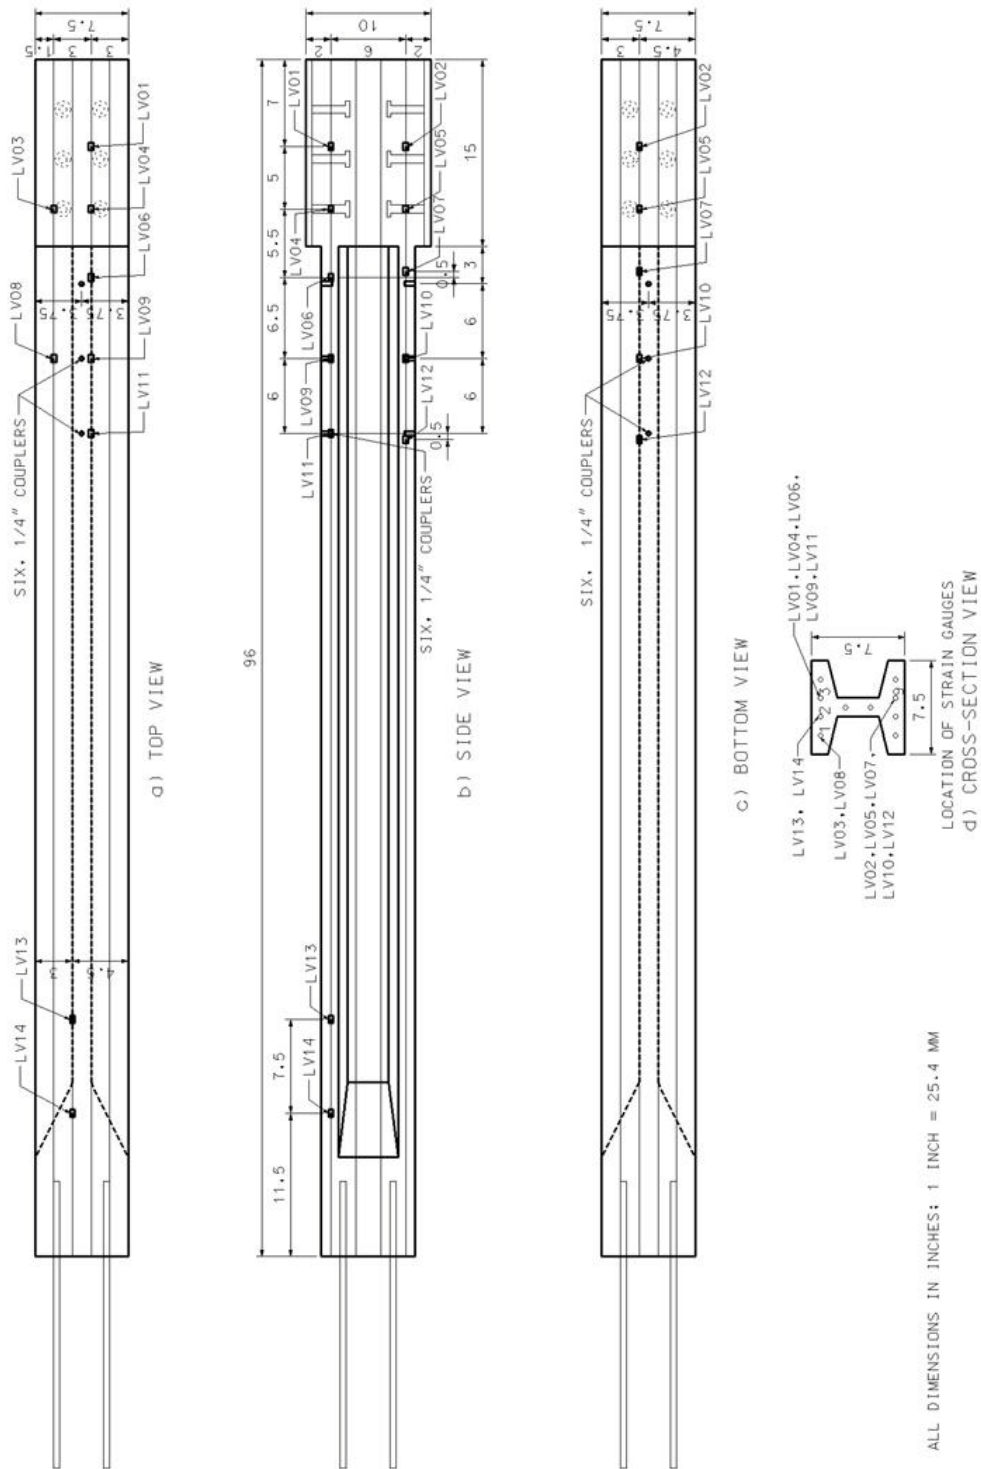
Details of instrumentation used for 8-ft (2.4-m) long UHPC laboratory test unit L1
